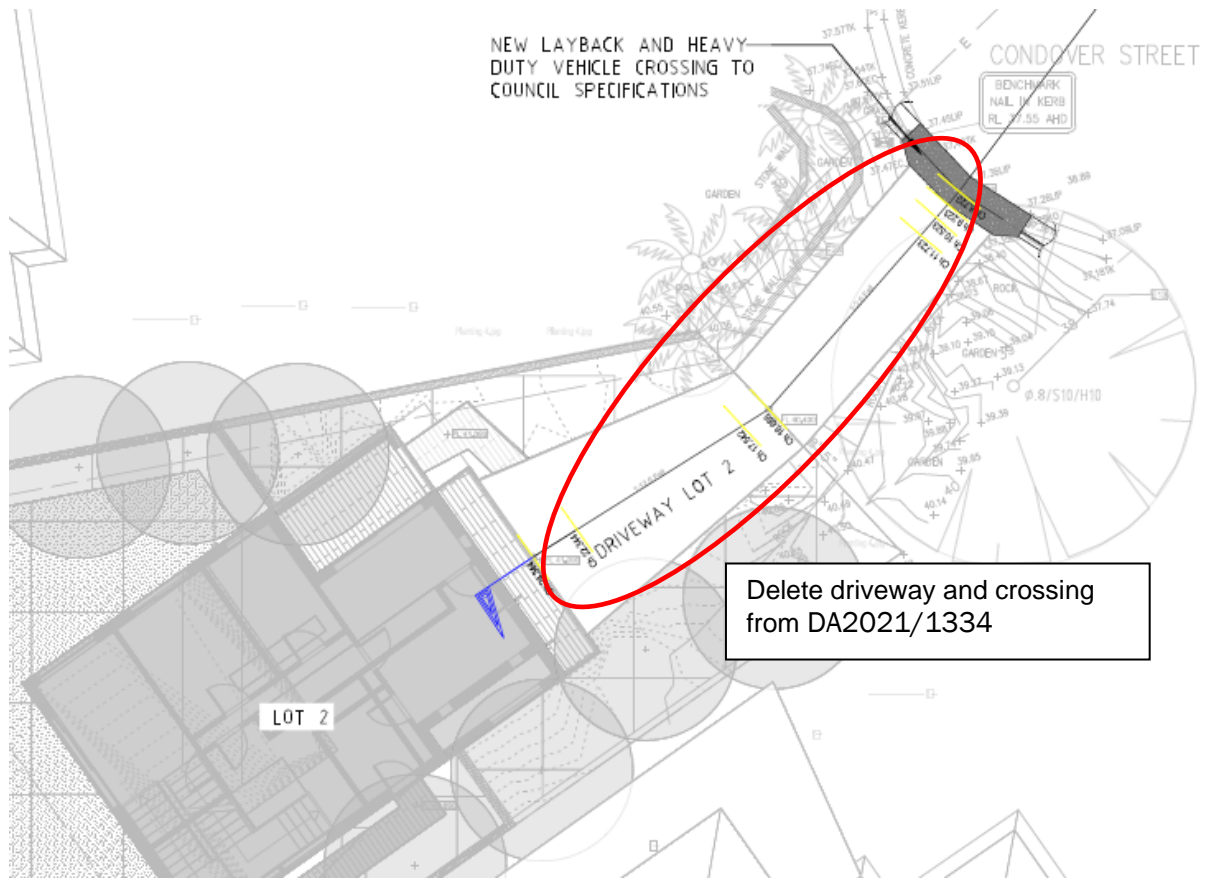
excerpt of the approved driveway layout plan CV-100 showing approved Lot 2
